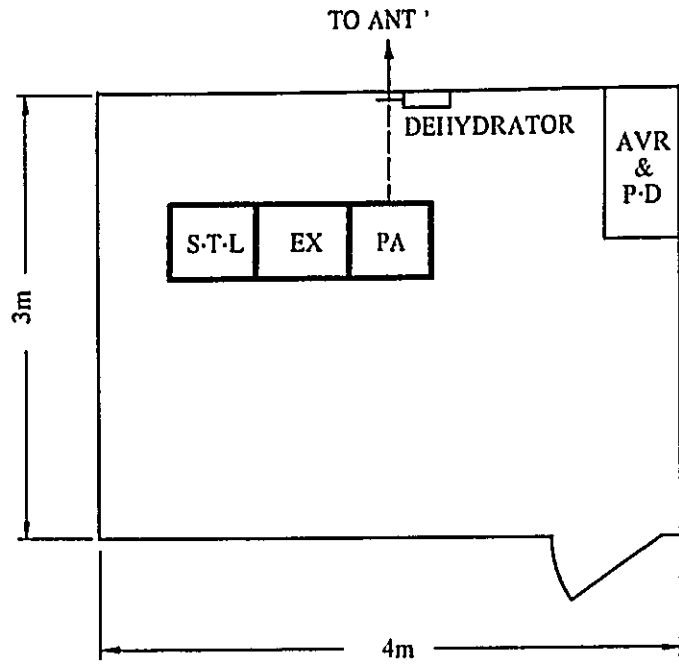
Floor Layout of 30~100W TV Transmitting Station
